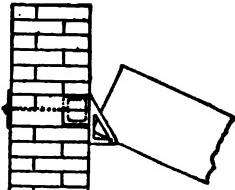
Release of Joist Without Damage to Wall.
